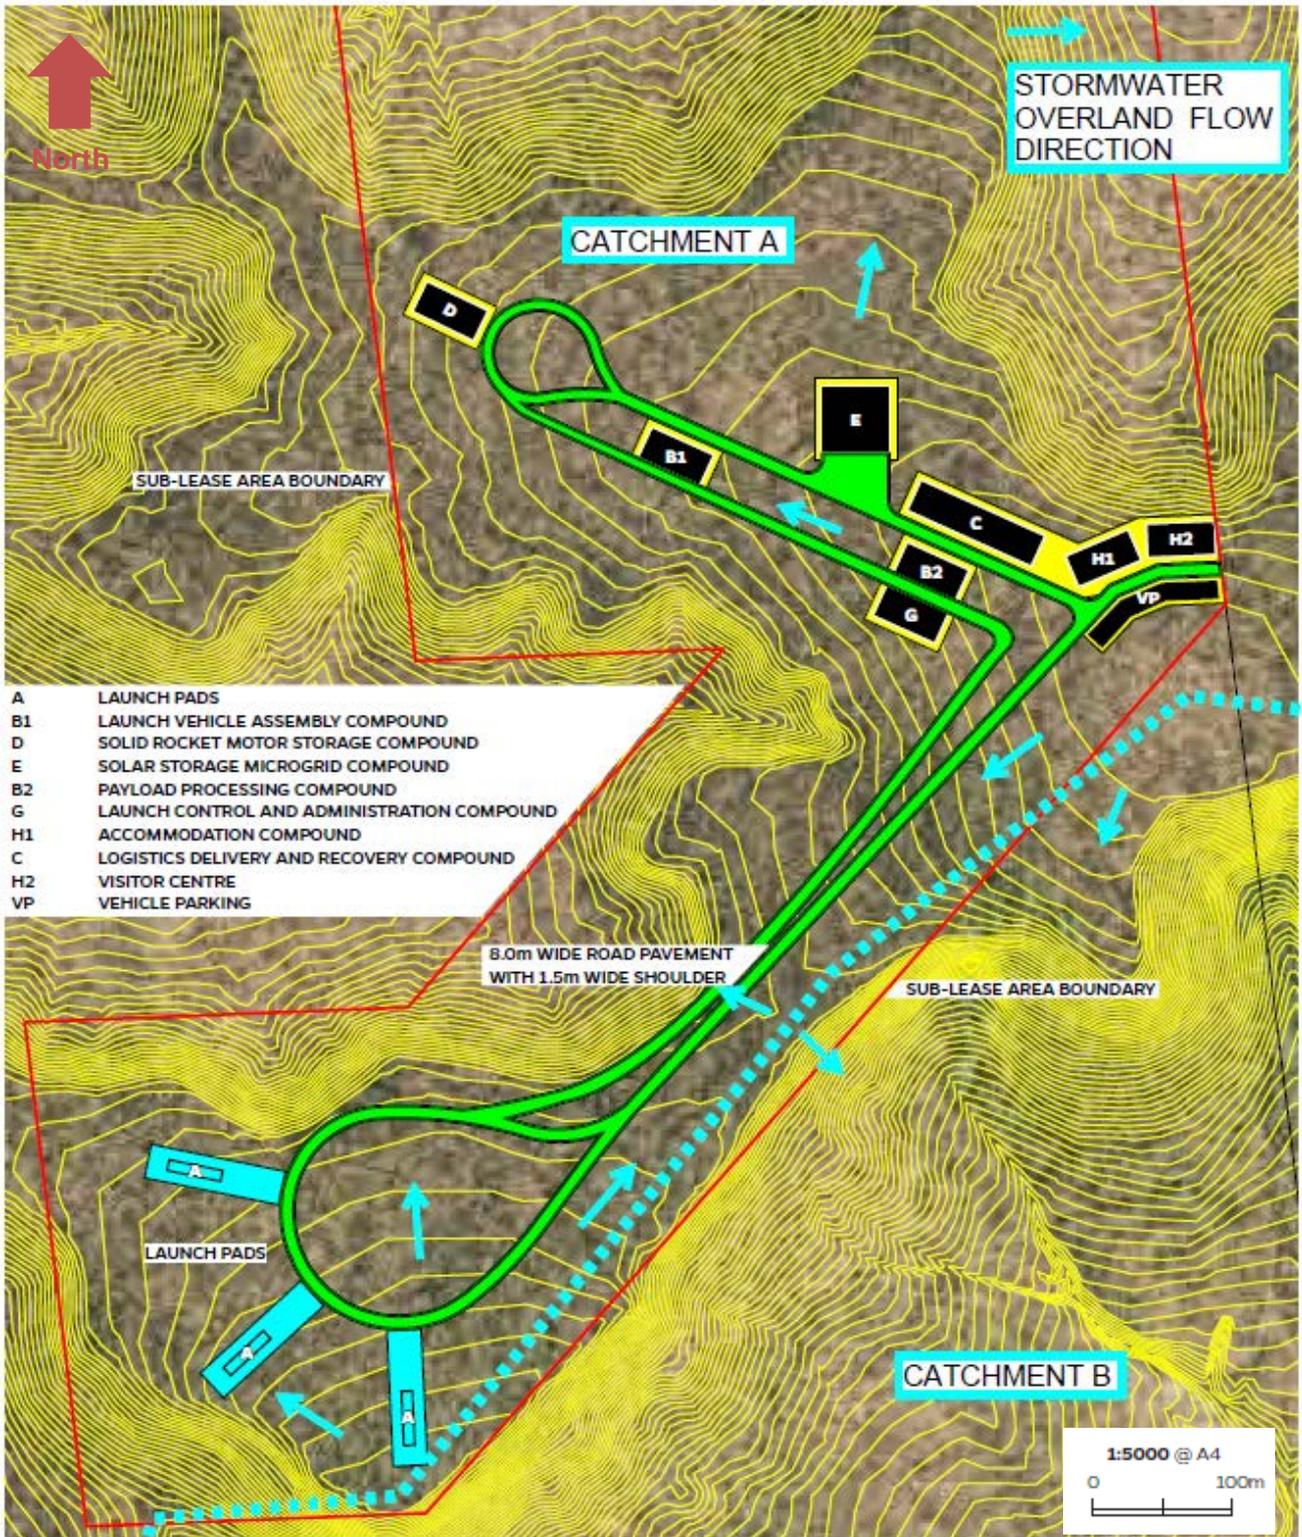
Site layout (Source: Conceptual Stormwater Management Strategy)
